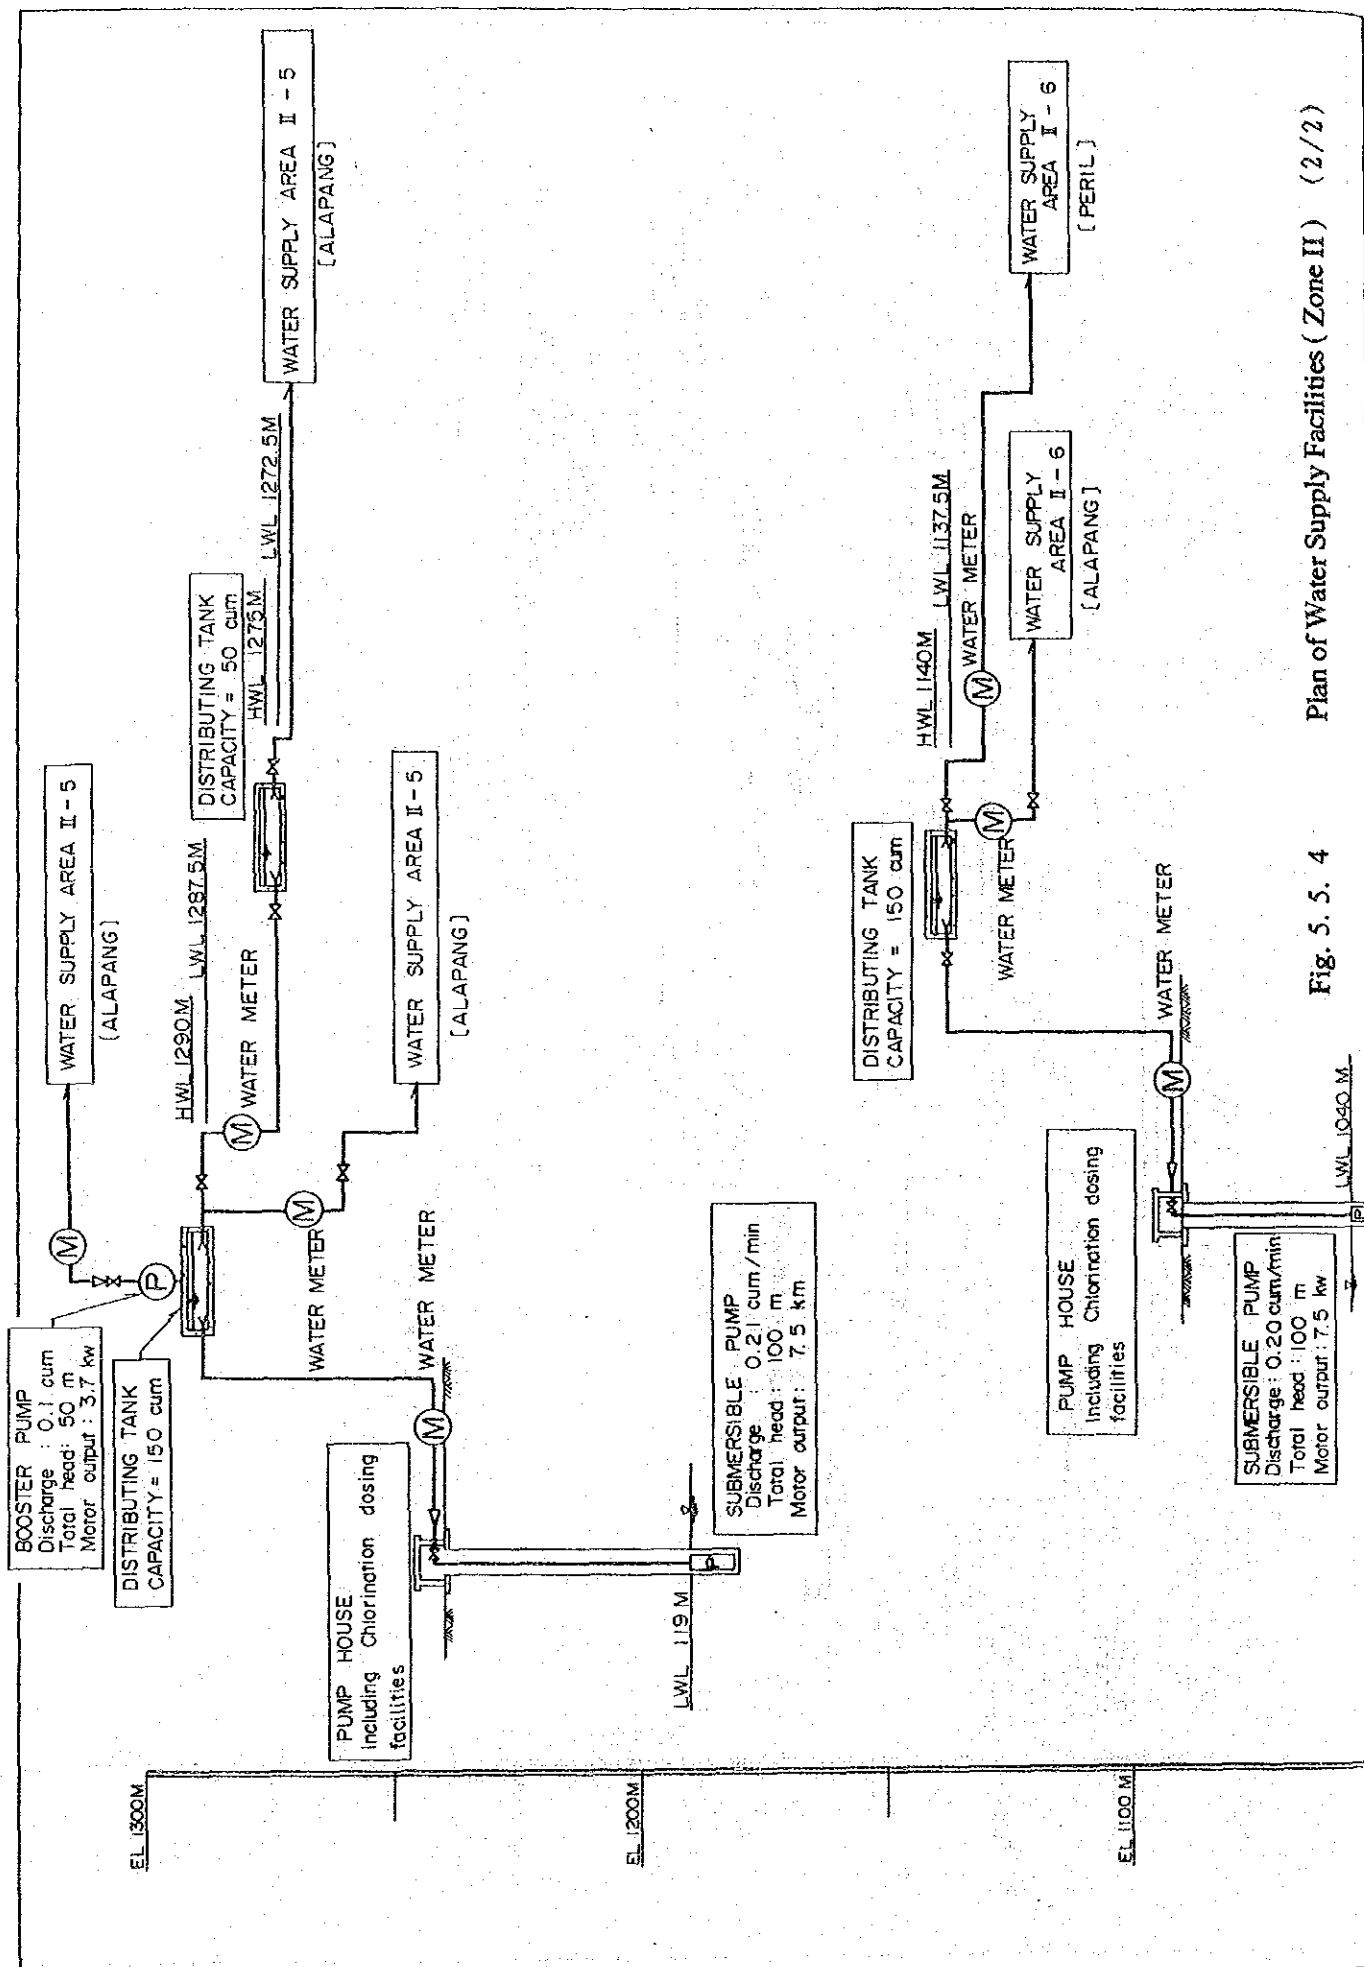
5. 4 Plan of Water Supply Facilities ( Zone II ) ( 2/2 )
